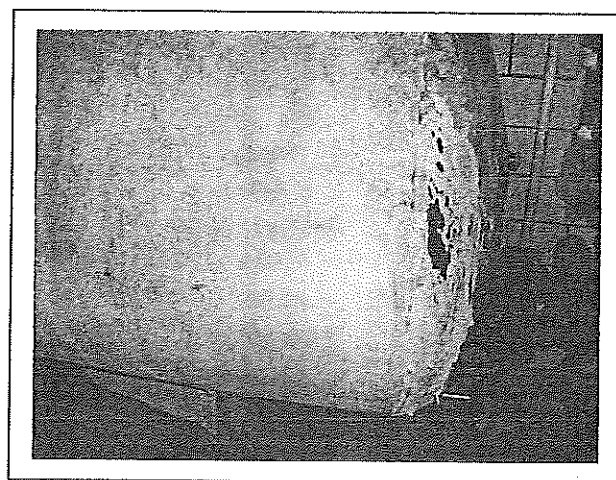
Viewing white tank insulation, Basement, South wall in Kitchen.
